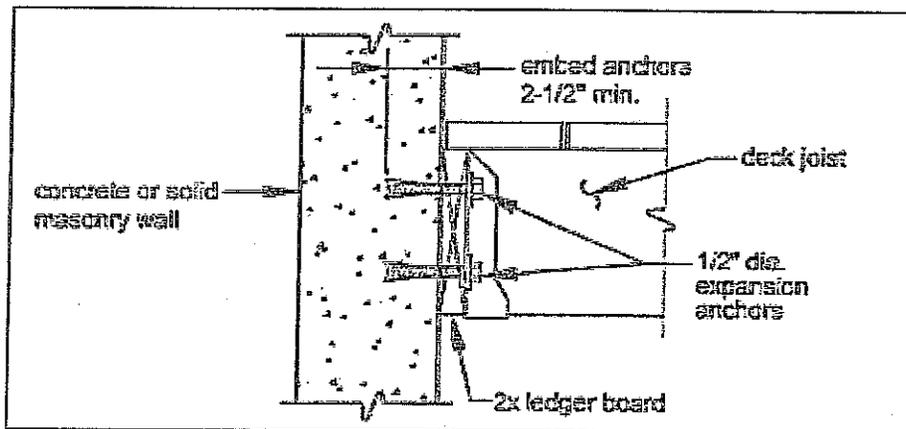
ATTACHMENT OF LEDGER BOARD-TO-FOUNDATION WALL (CONCRETE OR SOLID MASONRY)
